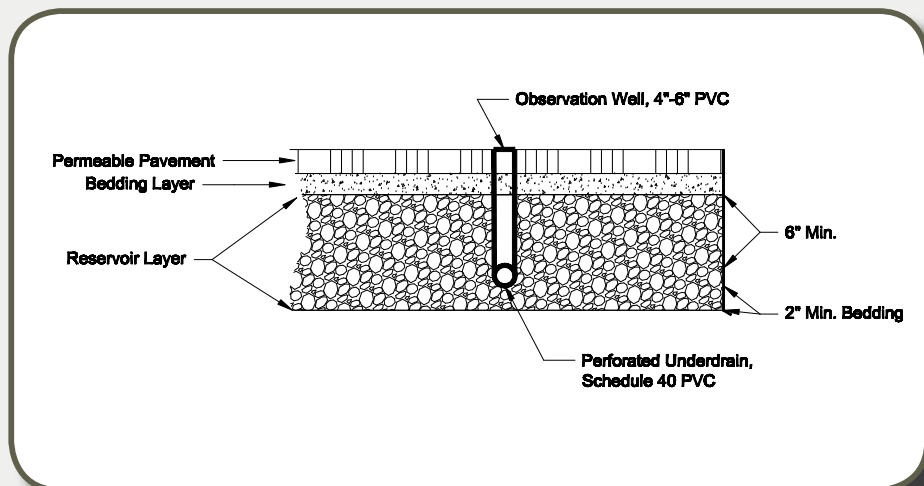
Typical Level I Permeable Pavement Section Sub-Areas 1 through 6
